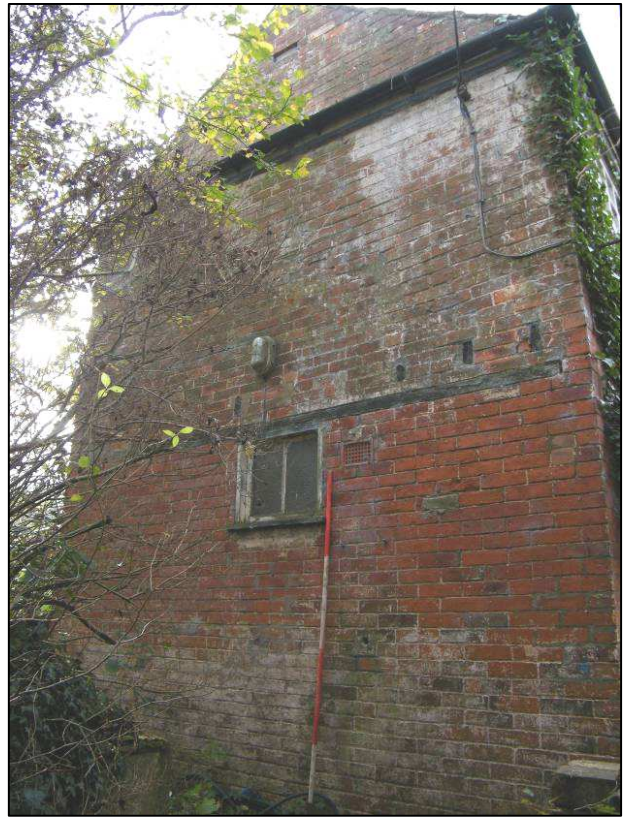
(Shot 10): Northeast elevation of Building A showing floor joists, looking south. Scale is 2m
